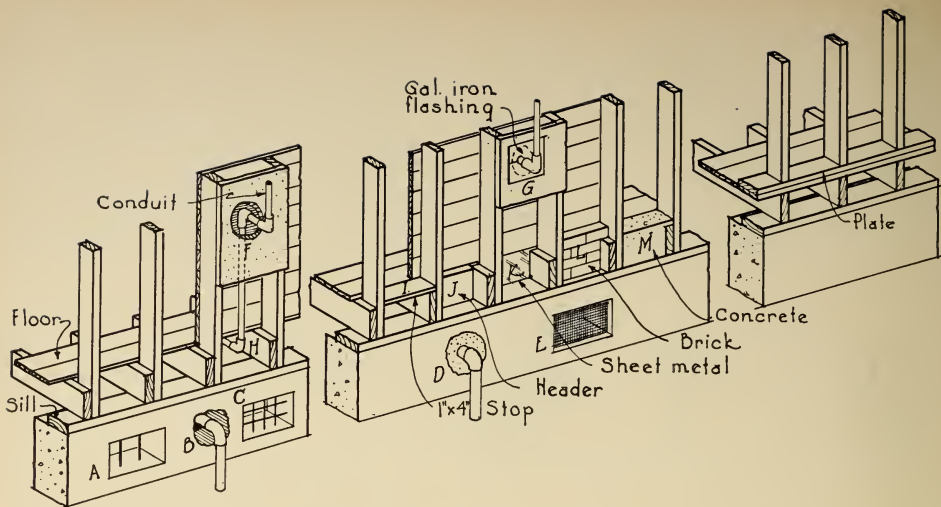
Structural details of buildings in relation to exclusion of rats and mice. Undesirable features: A, ventilator to basement with widely spaced bars; B, space about entrance of pipe; C, ventilator with wide-mesh grille; F, hole in wall around entrance of conduit; H, free passage for rats from below the floor into the walls.
